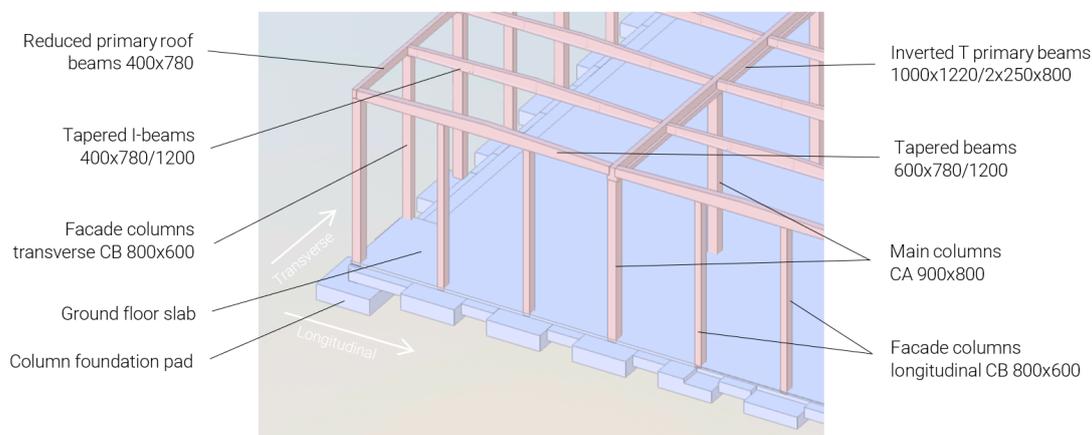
3D view of structural elements within the concrete (IXD) warehouse frame (RHDHV Internal Document, 2020)
